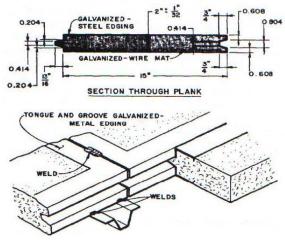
Gypsum – Plank Details (Fang, 1966)
